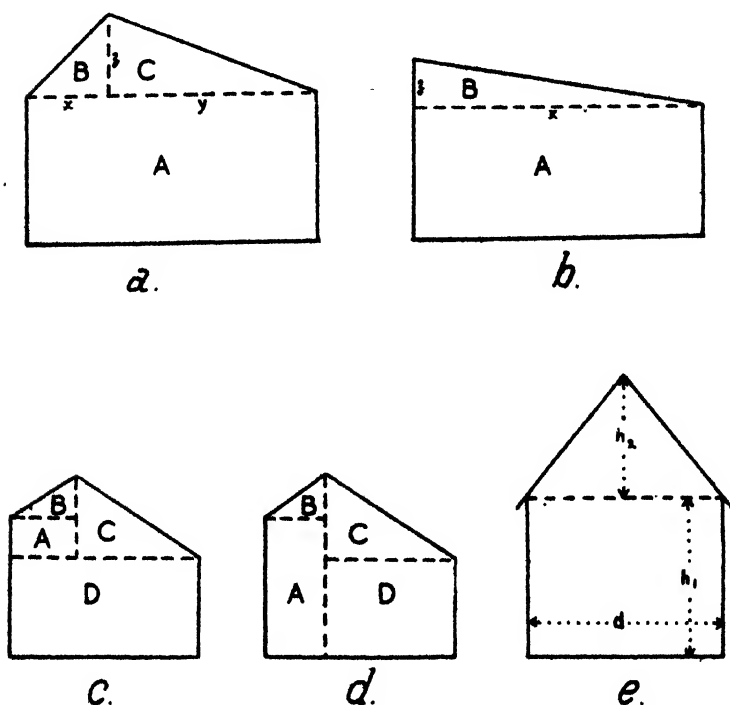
Cross sections of rooms having: *a* Ridged roof and opposite walls of equal height; *b* Lean-to roof; *c* and *d* Ridged roof and walls of unequal height; *e* Conical roof and circular wall.
